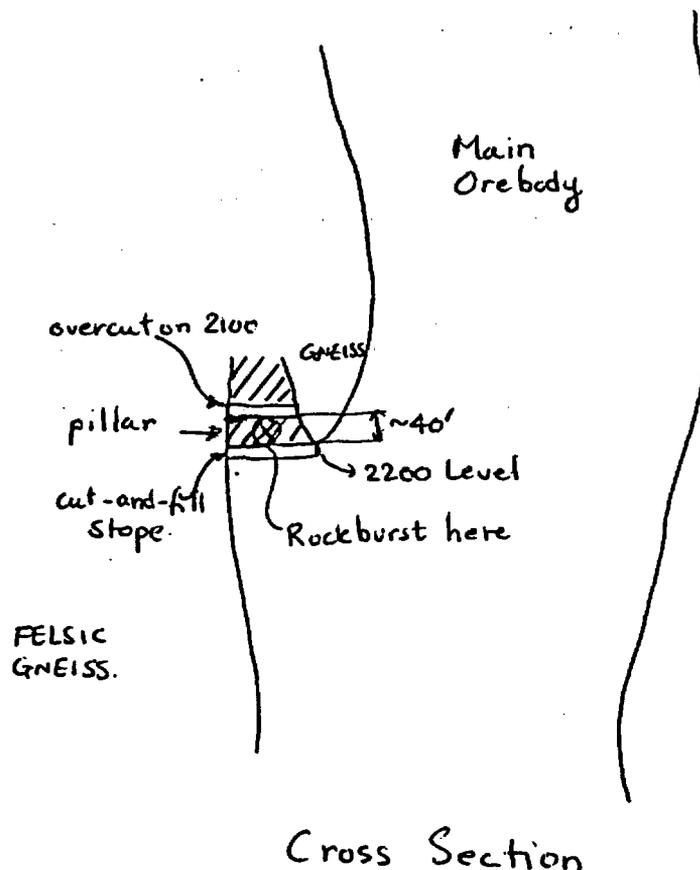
Cross-section of Orebody Showing Bursting in Sill Pillar of Cut-and-Fill Slope
